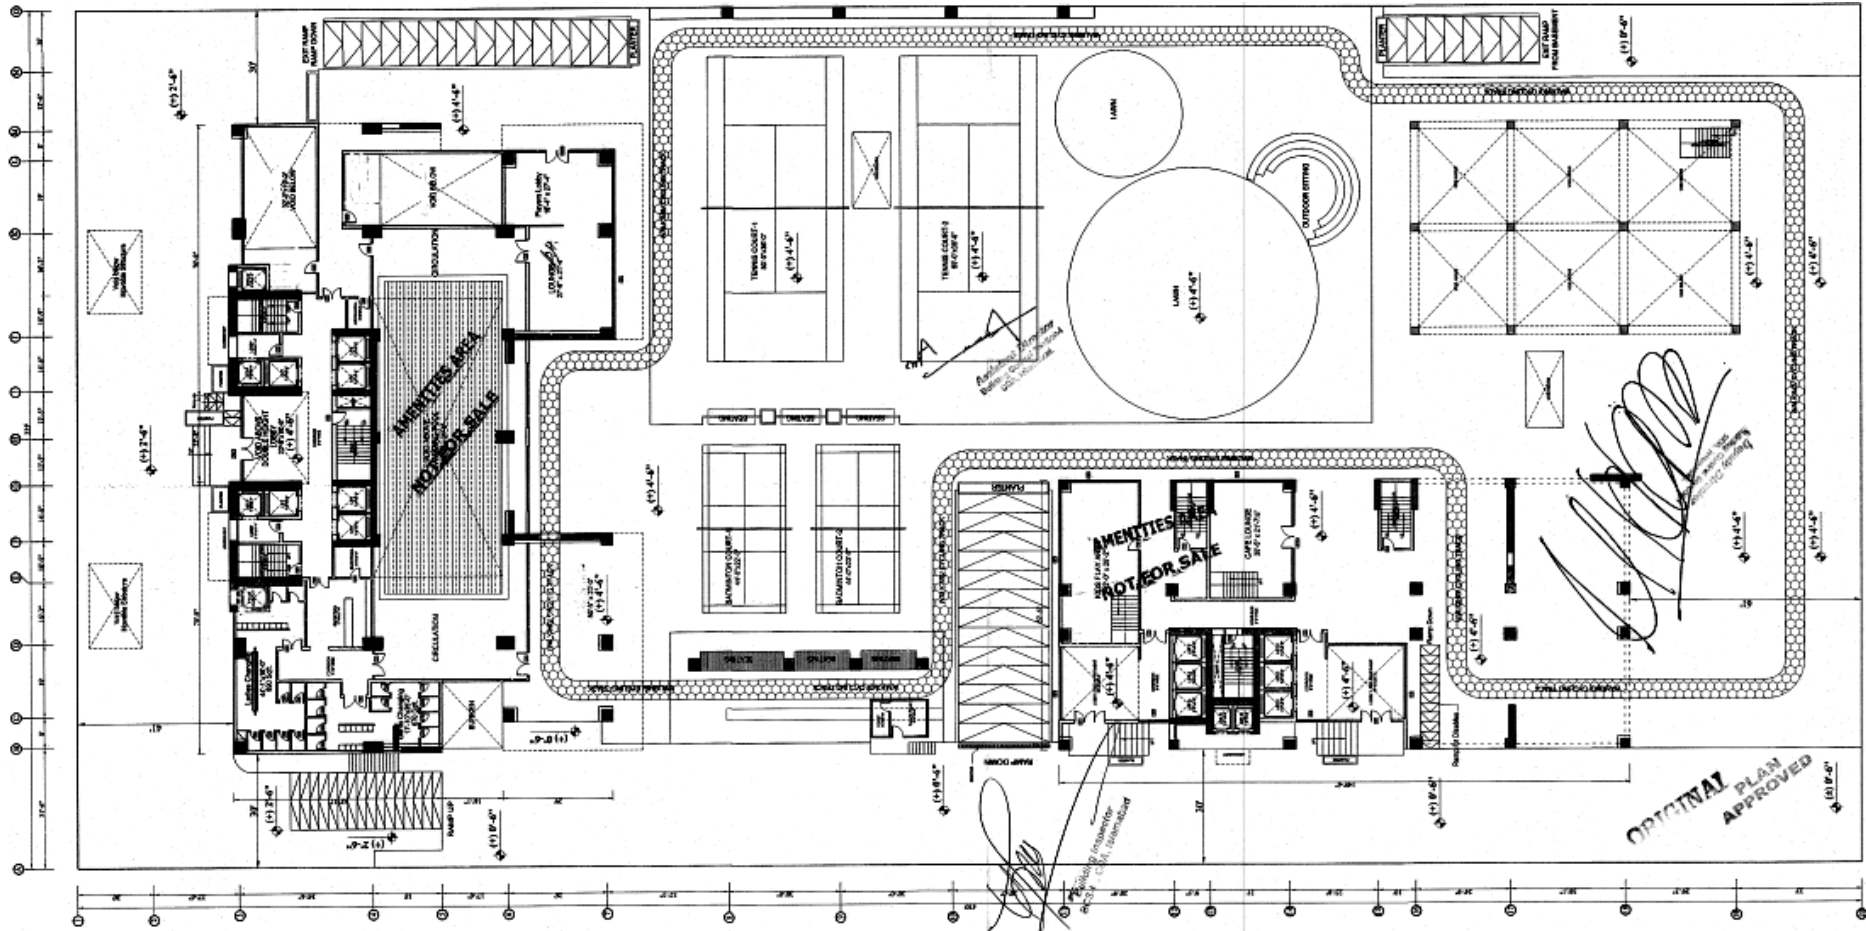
Layout Plan of 1st Floor of The Garden Residence Project, Sector F-10 Markaz, Islamabad
